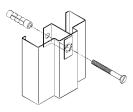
Typical construction HARDWARE CHANNEL PROPRIETARY CORES • POLYSTYRENE CORE WITH ARMOR PLATING LEVELS 2-3 • BIATTING WITH ARMOR PLATING AND BUILT IN CLOSER REINFORCEMENTS LEVELS 4-8
